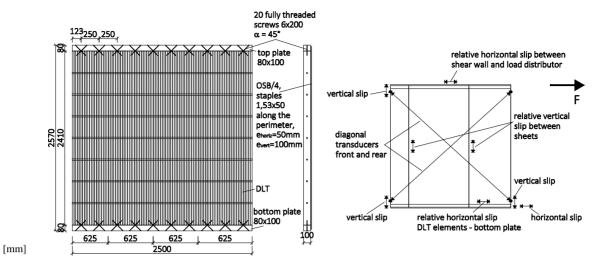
Left: Standard shear wall. Right: Arrangement of measuring equipment.
